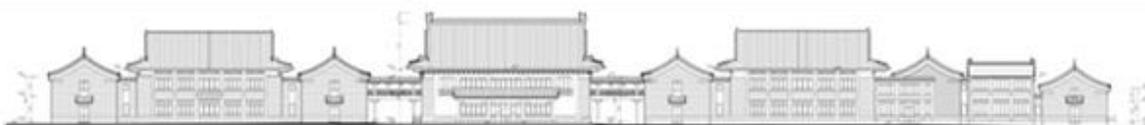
The east elevation of the Humanities Buildings. Source: Qi Zhang Architectural Design Studio.
